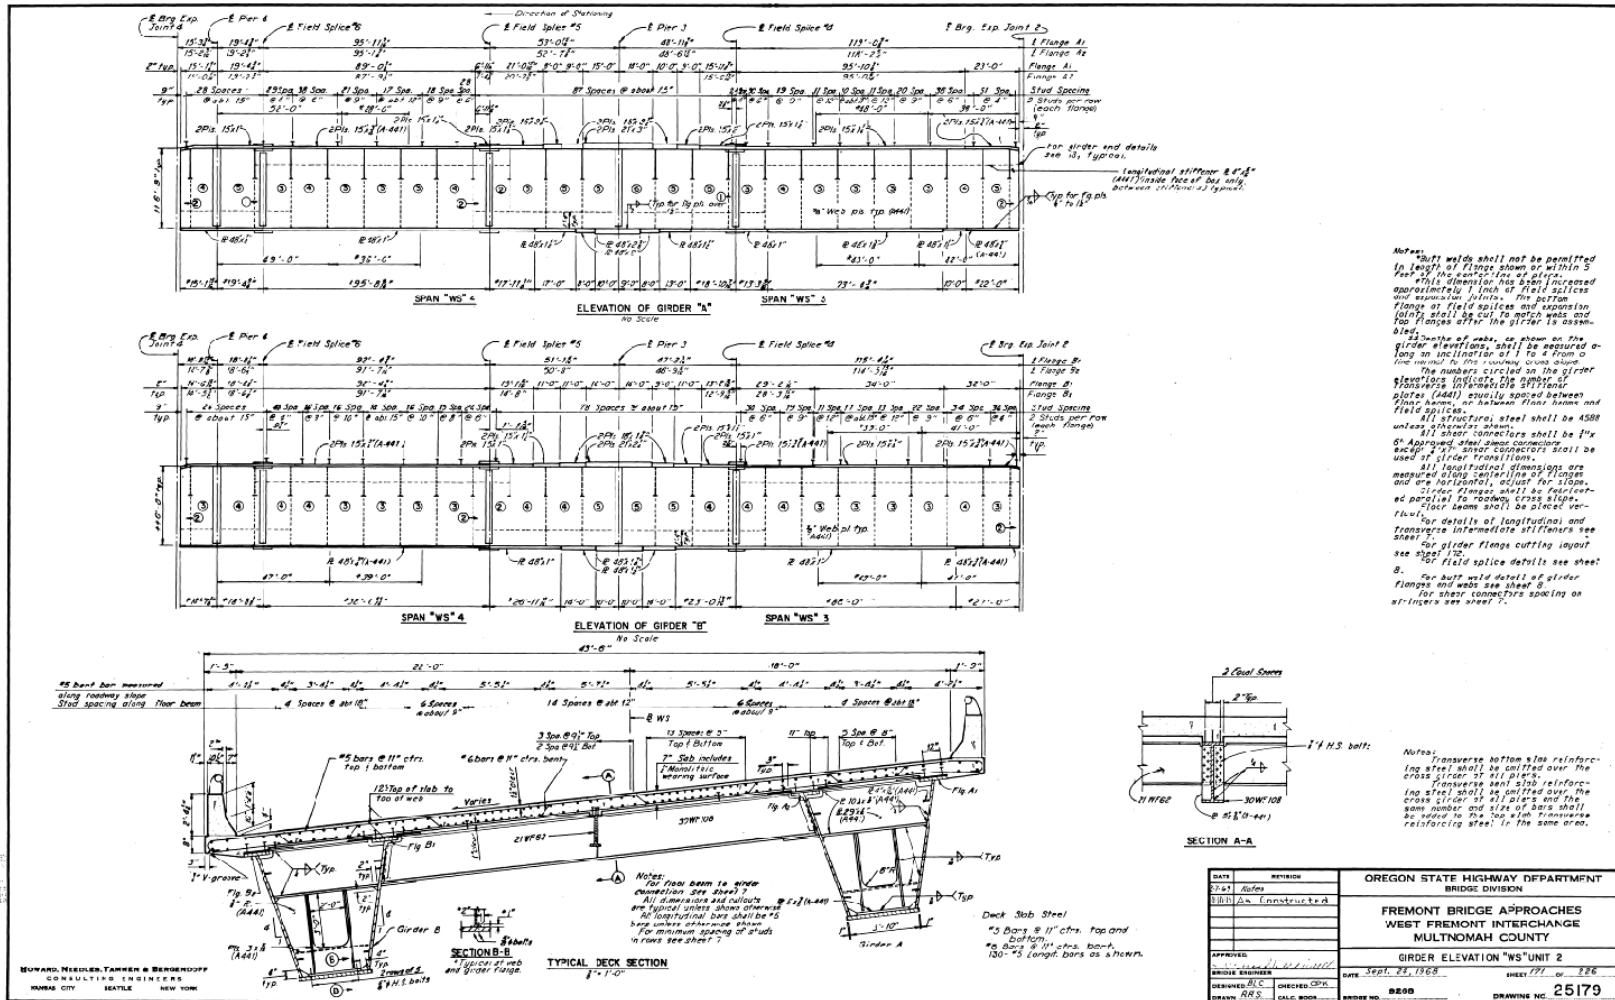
Structural details of WS Unit 2 Bridge superstructure 09268B.
